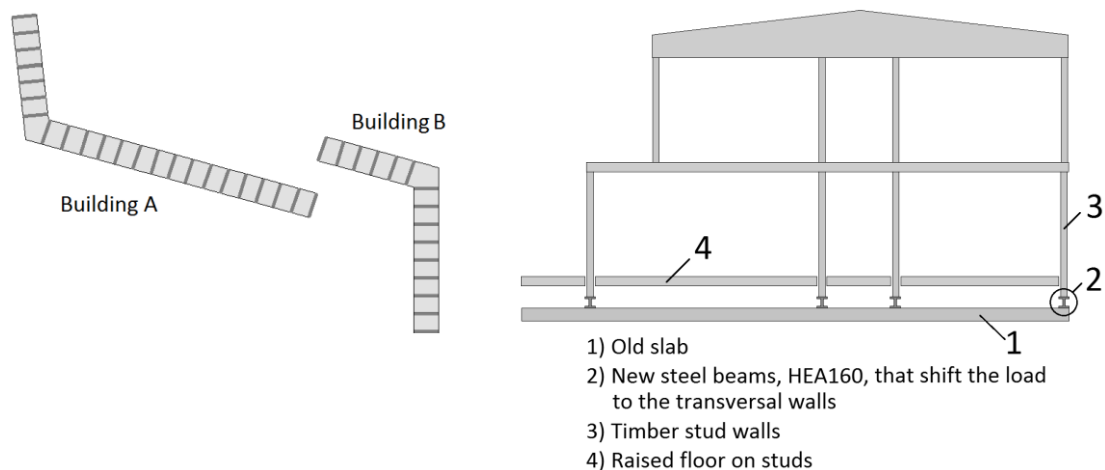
Buildings at Glasmästaregatan, a) the two buildings viewed from above with load-bearing transversal walls, b) load-bearing system for the extension.
